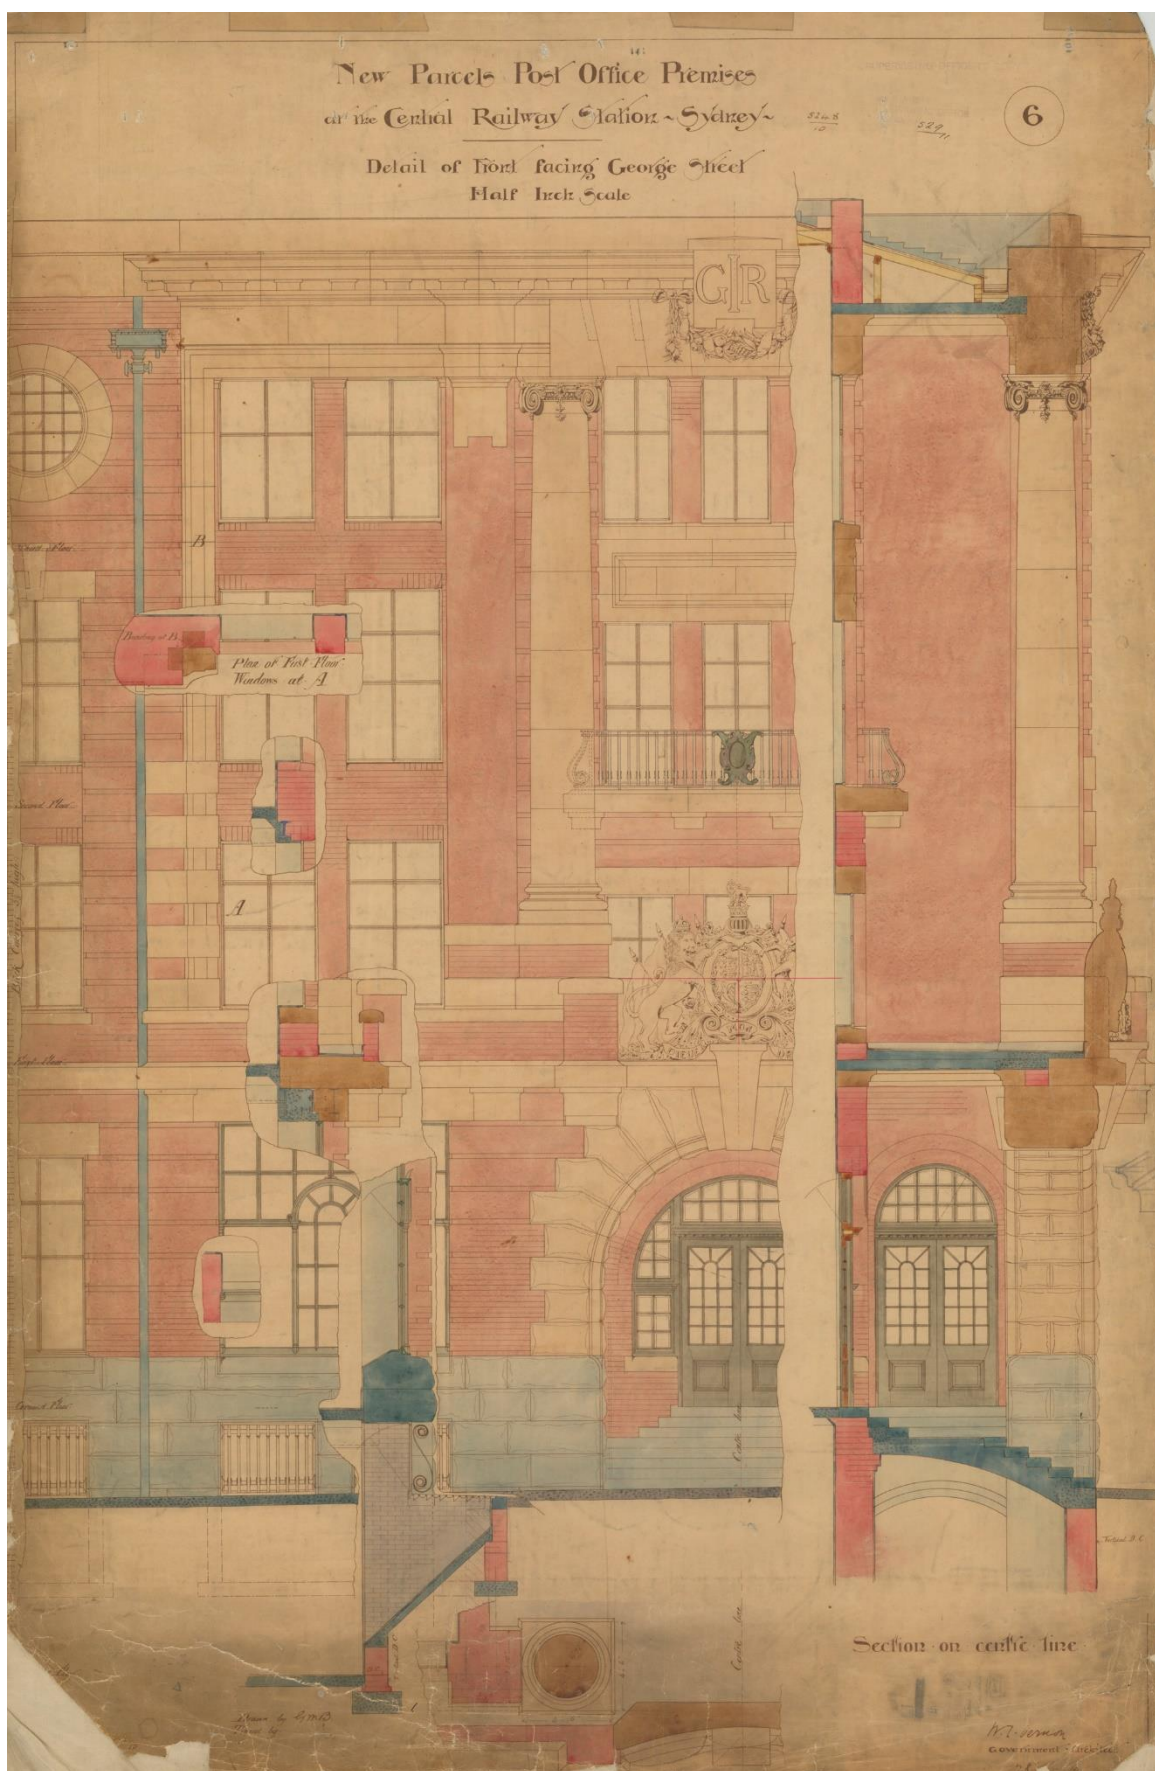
New Parcels Post Office Premises at the Central Railway Station Sydney, detail of front facing George Street half inch scale - section on central line, 1910.
